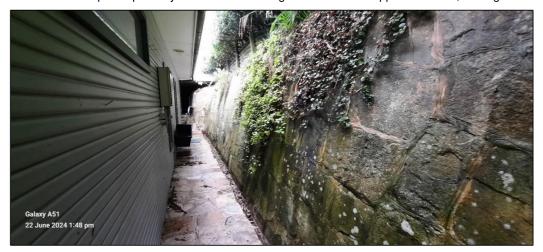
Stone paved pathway and stone wall along western side of upper floor level, looking south.
